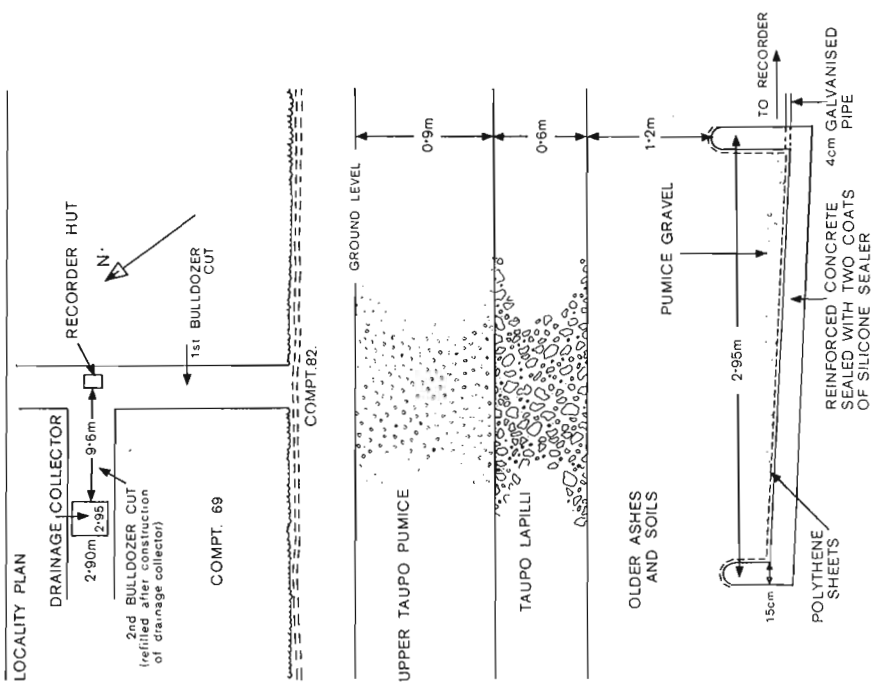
Locality plan and side elevation of lysimeter, Compartment 69, Kaingaroa Forest.
